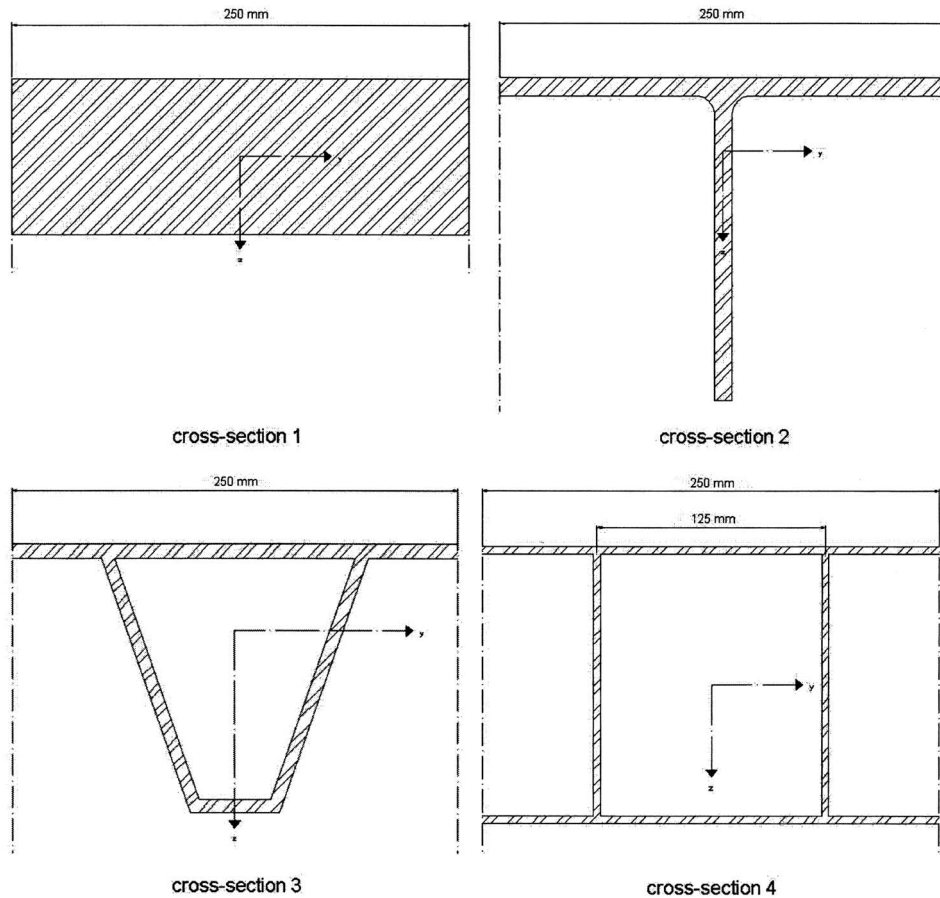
Cross-Section 1 is a simple plate and in Cross-Section 2, the plate is stiffened with a leg perpendicular to it. Cross-Section 3 is very similar to a corrugated plate and Cross-Section 4 is essentially a sandwich construction.
